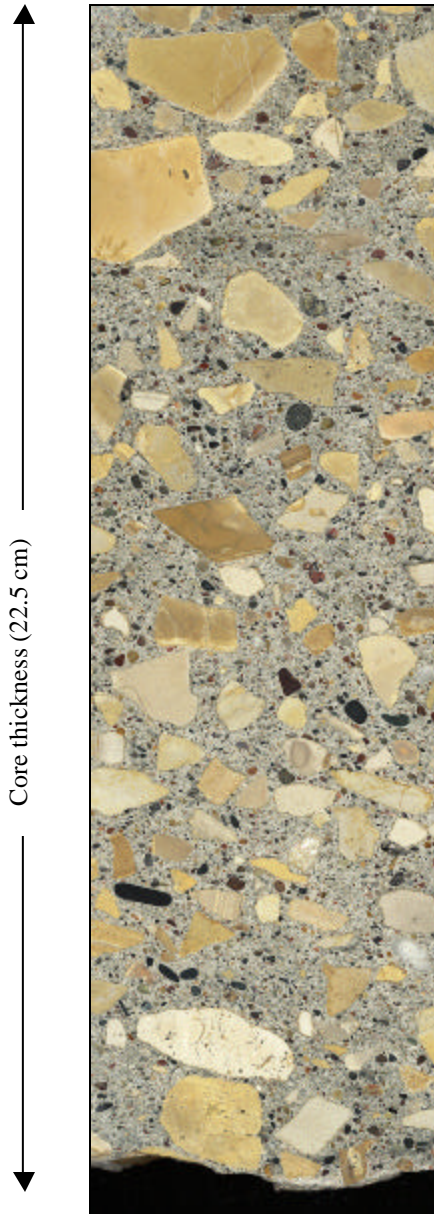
Polished cross-section of pavement section 19-3006.
